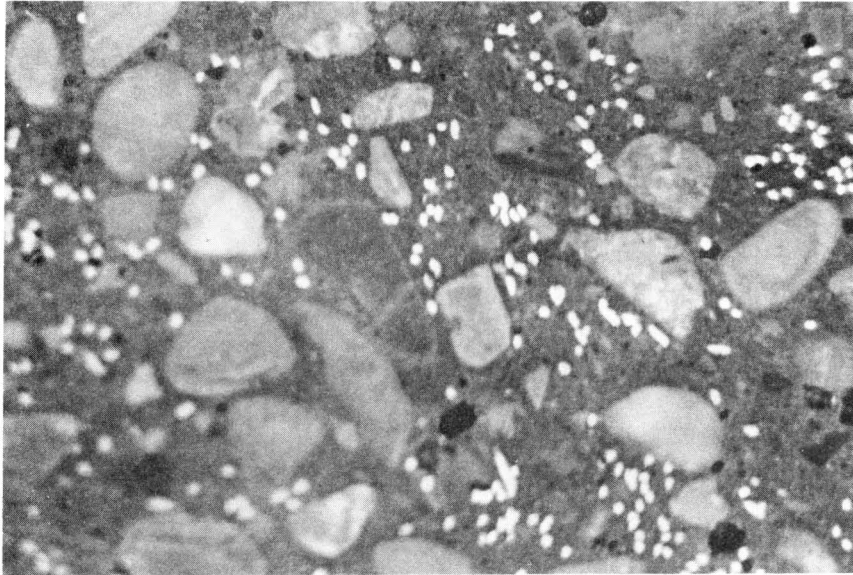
A cross section of a test beam specimen that shows a good distribution of steel fibers. (Mag. 1.5X)
